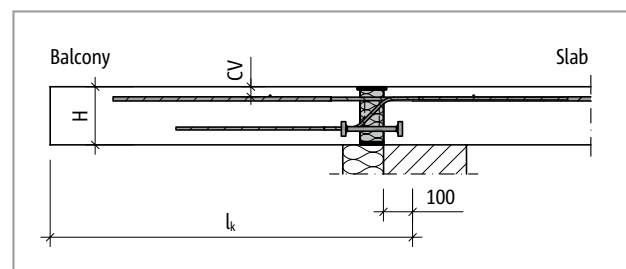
Schöck Isokorb® T type K-M12: Static system
